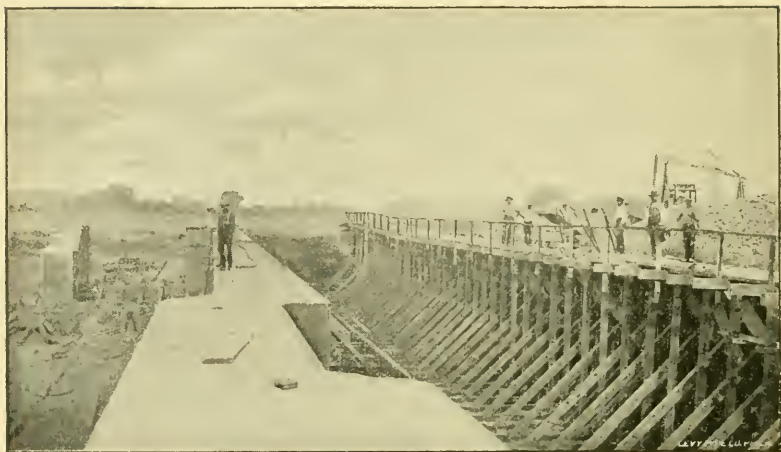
PLACING CONCRETE, SOUTH WALL OF GUARD LOCK (SEPT. 9, 1893).
